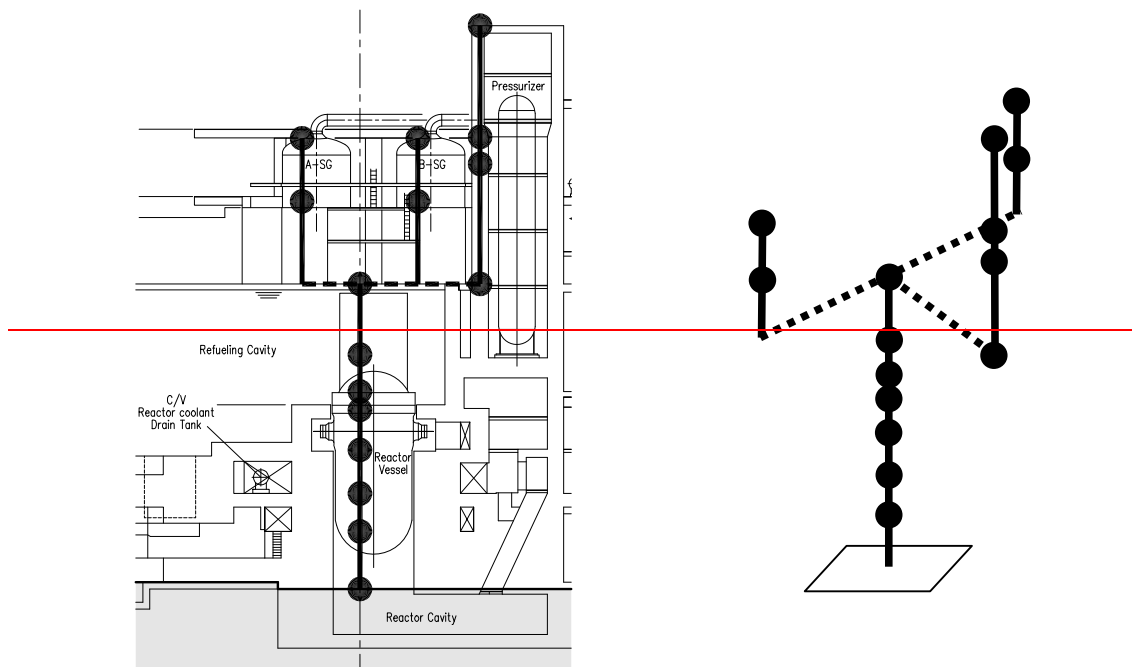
H-2 (Sheet 1 of 2) Lumped Mass Stick Model for Buildings (R/B, PCCV, Containment Internal Structure)
